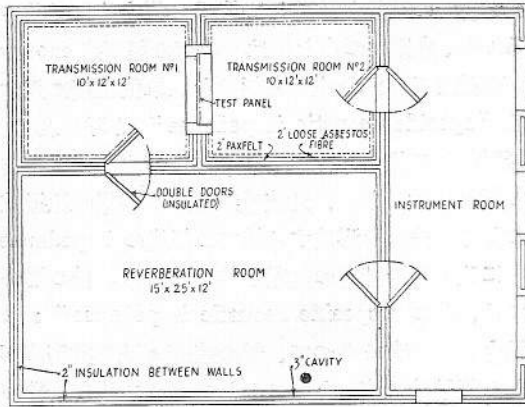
Plan of Acoustic Laboratory at the Newall Insulation Company's Works.
